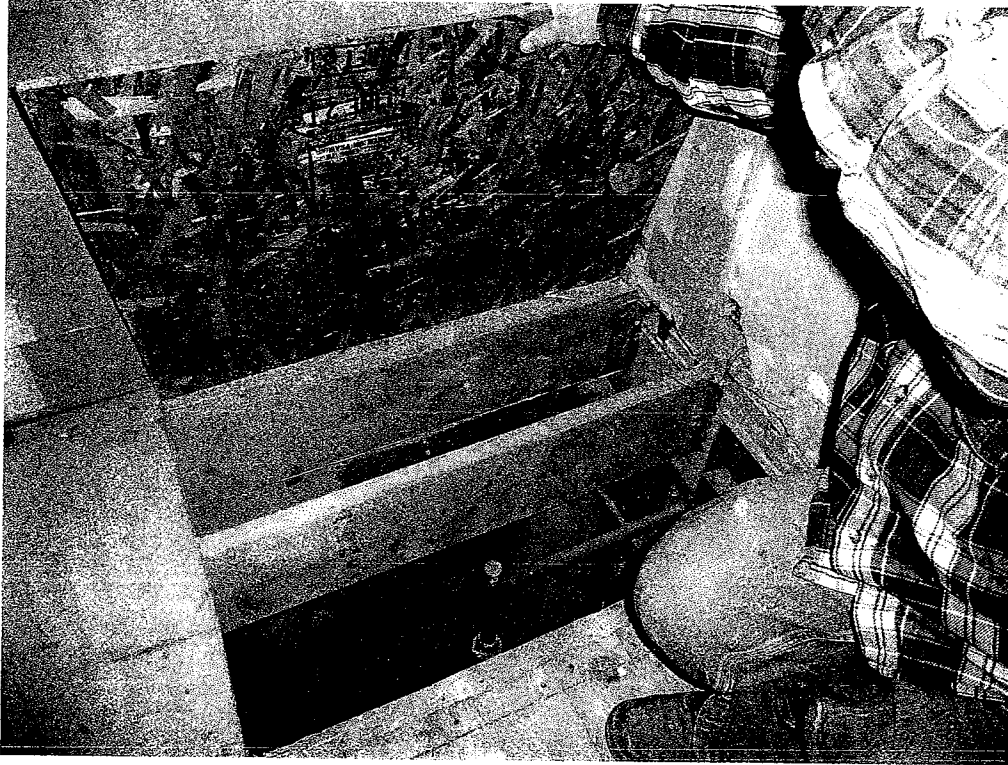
Proposed location of vertical ductwork chase (revised framing required due to interference)
